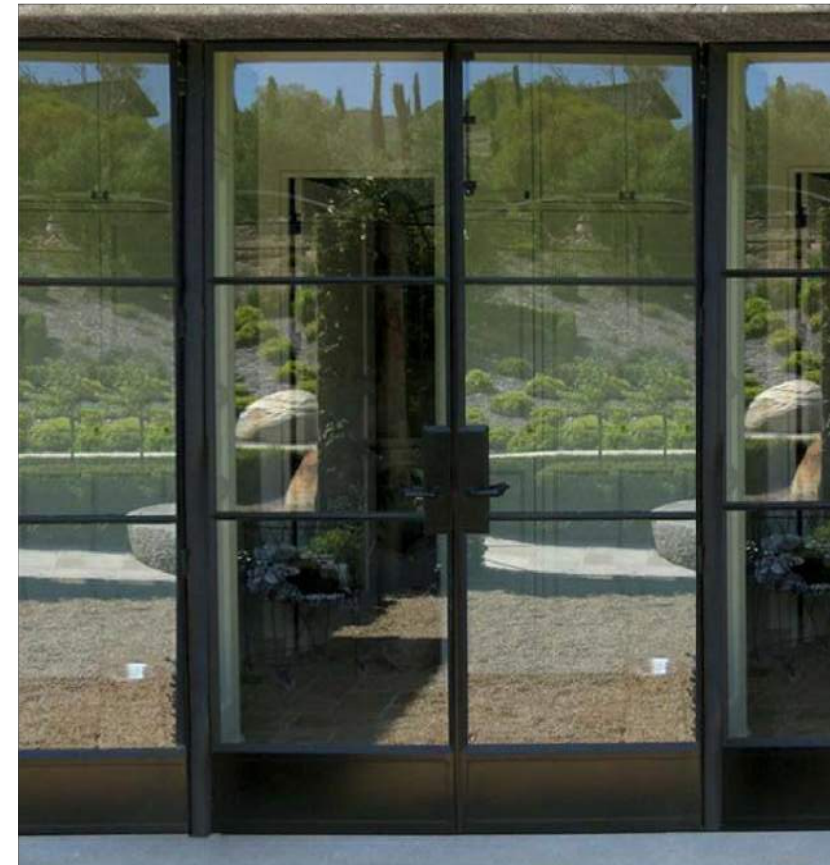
IMAGE: STEEL/ALUMINUM DOORS. PAINTED STEEL TO BE USED ON NEW CONSTRUCTION AT WEST PROPERTY WITH PUBLIC USE FUNCTIONS. KYNAR PAINTED ALUMINUM TO BE USED ON EAST PROPERTY NEW CONSTRUCTION.
